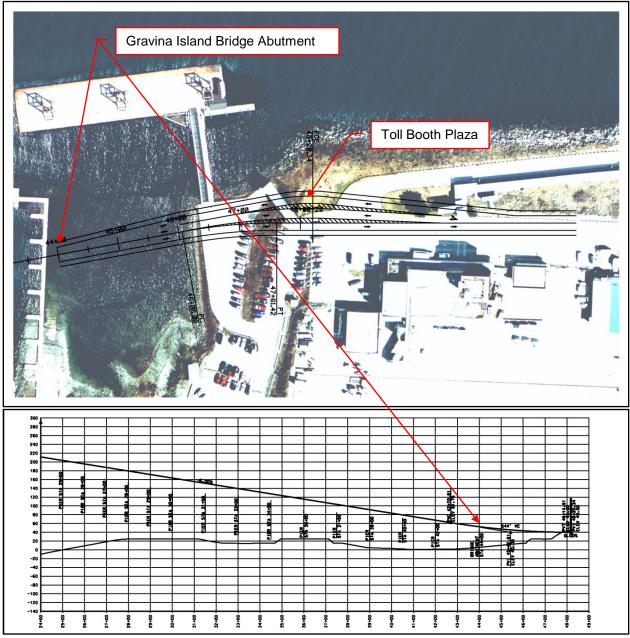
, East Abutment and Airport Access Road at Airport Terminal
